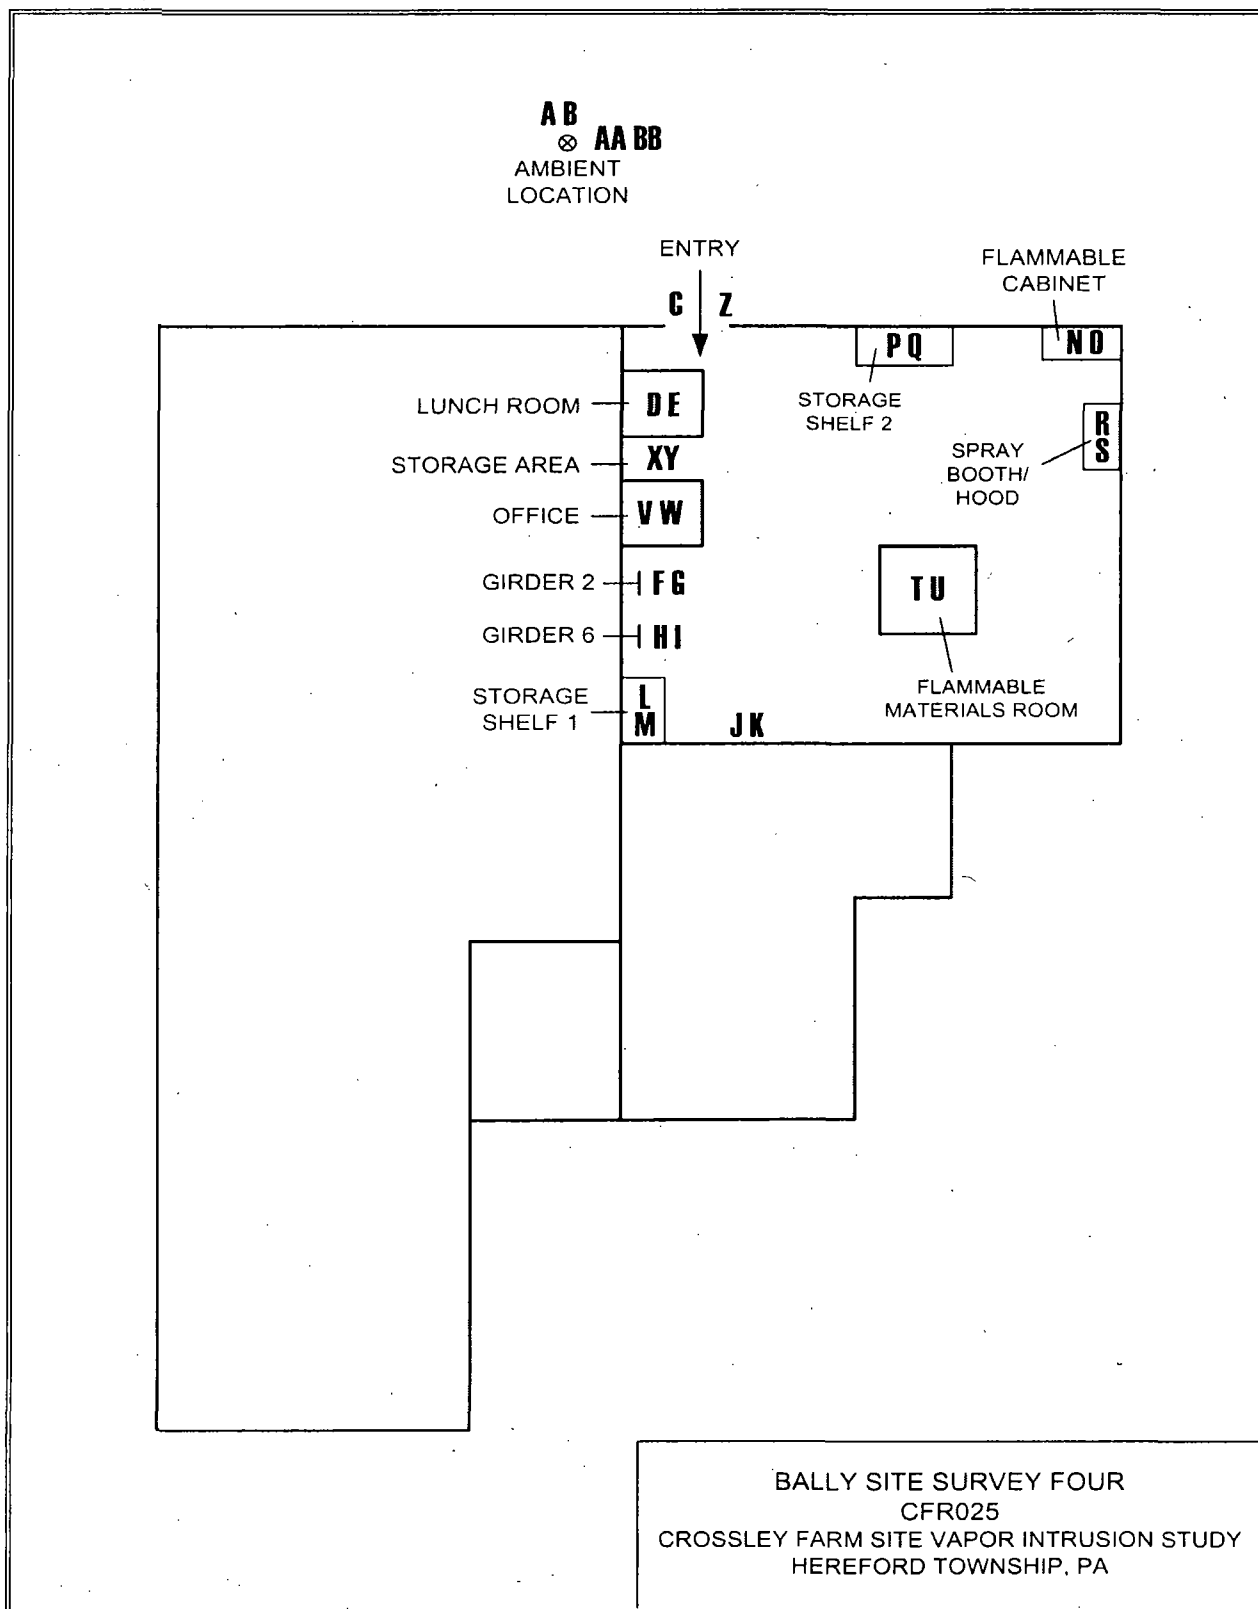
Bally Site Survey Four Floor Plan, CFR025
